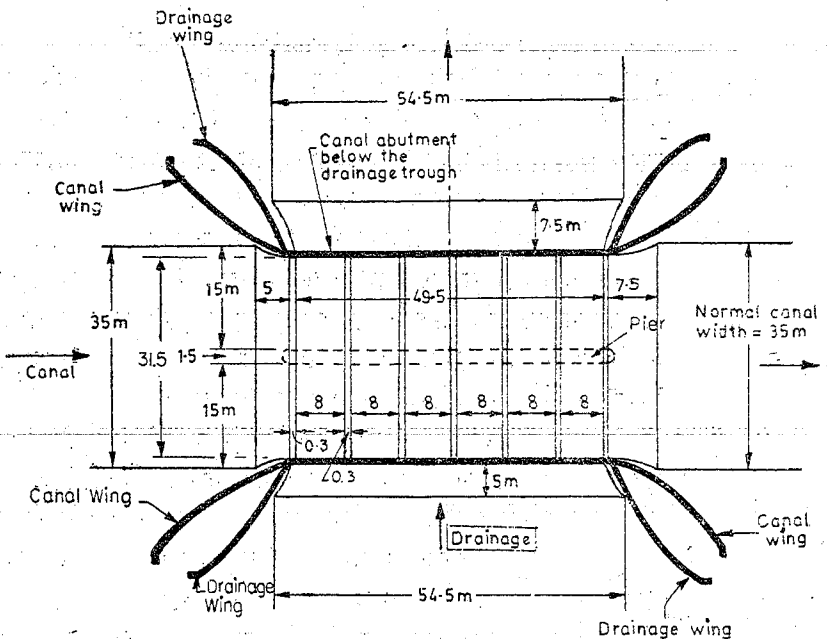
Indicative Plan of the Super-passage Crossing in Example 14.3.
